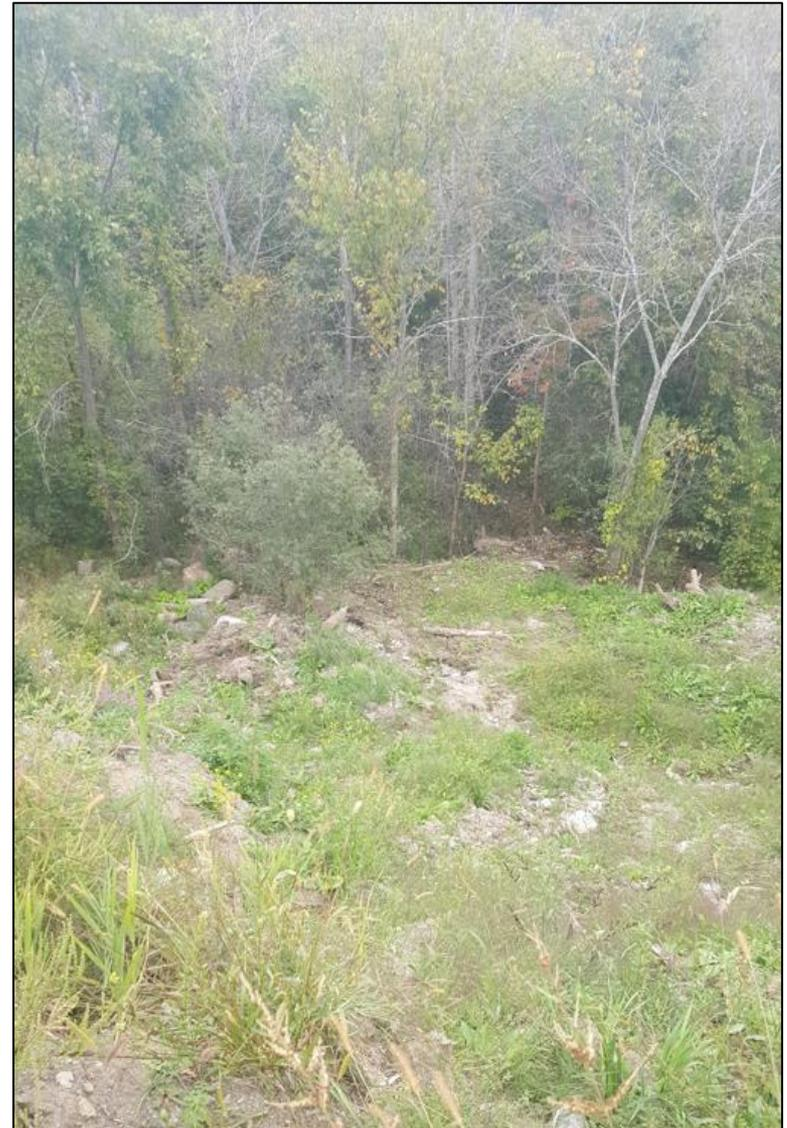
View looking down slope between BH104-21 and BH105-21, where a landslide occurred within the slope. This portion of the slope is now less steep, after failure.
